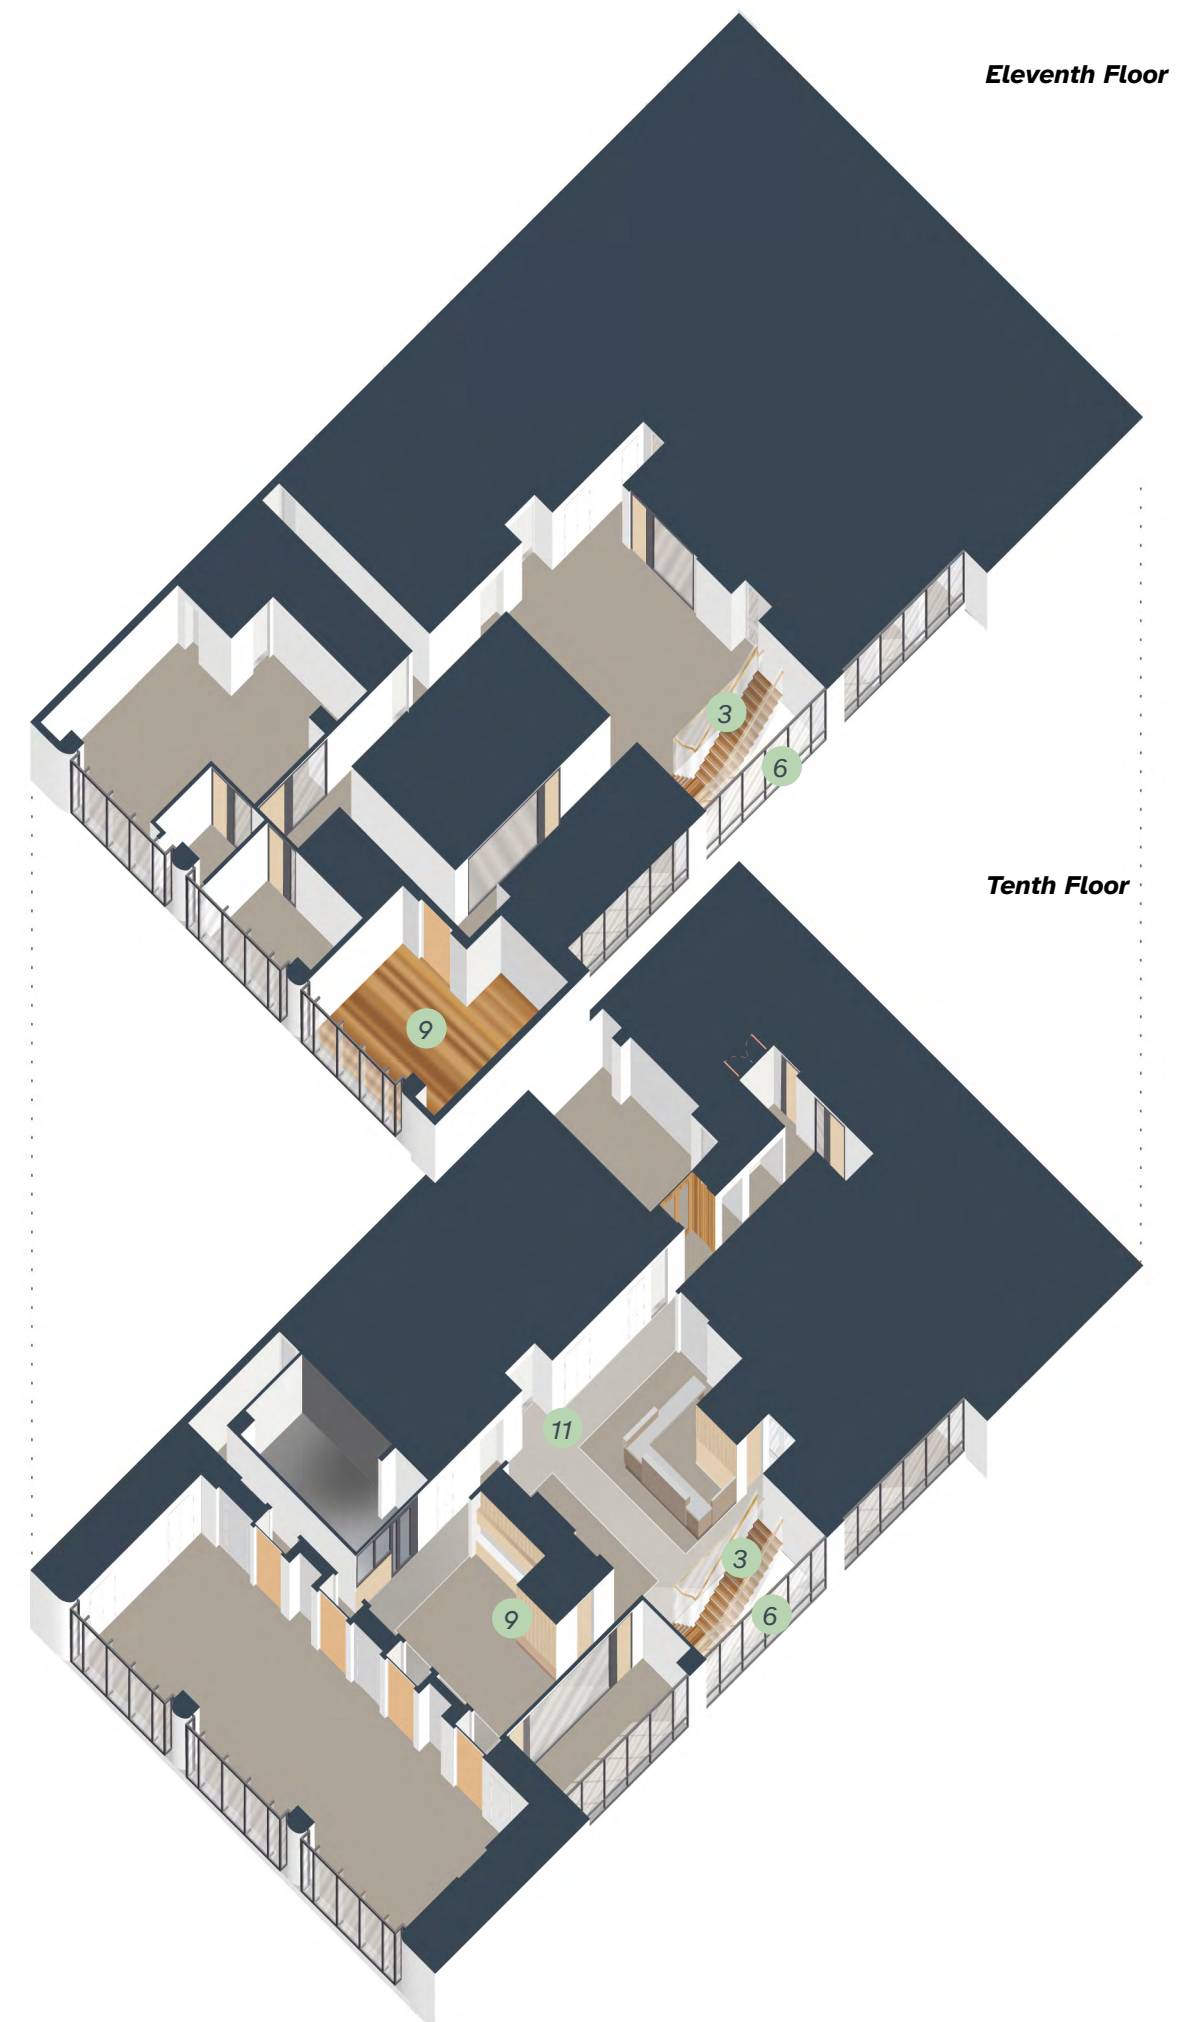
Floor Plans of LightHouse, showing spatial relationships
